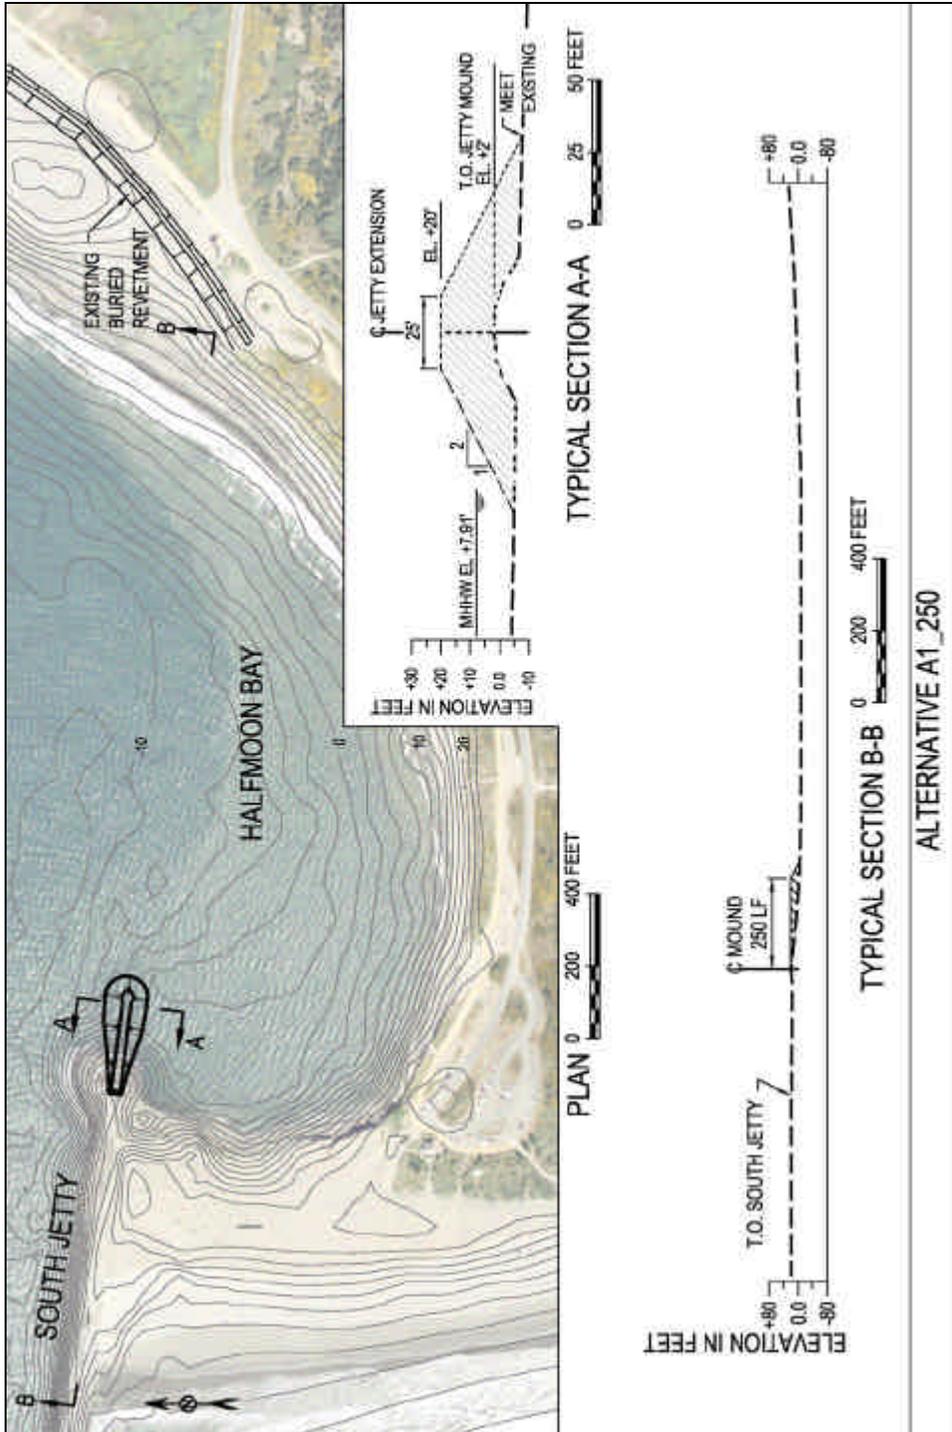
Alternative A1\_250 raise submerged portion of South Jetty
